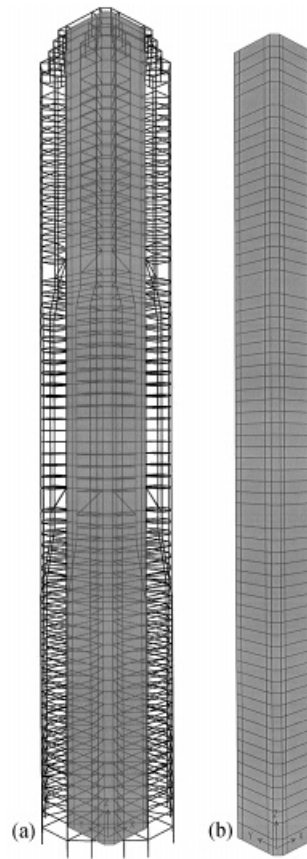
(a) The simplest 3-D model with a closed core wall and framing system. (b) The core wall component of FEM2.
